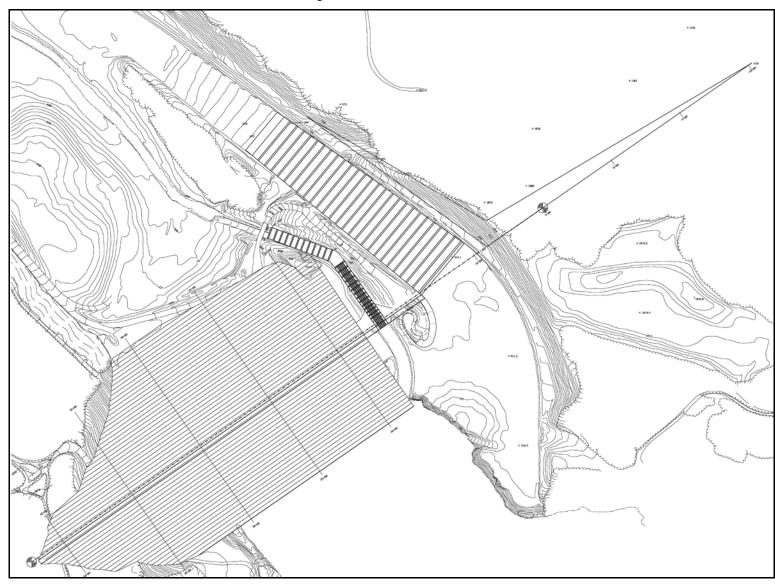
Plan of Potential SRS Raised 160 feet, Configuration 1
